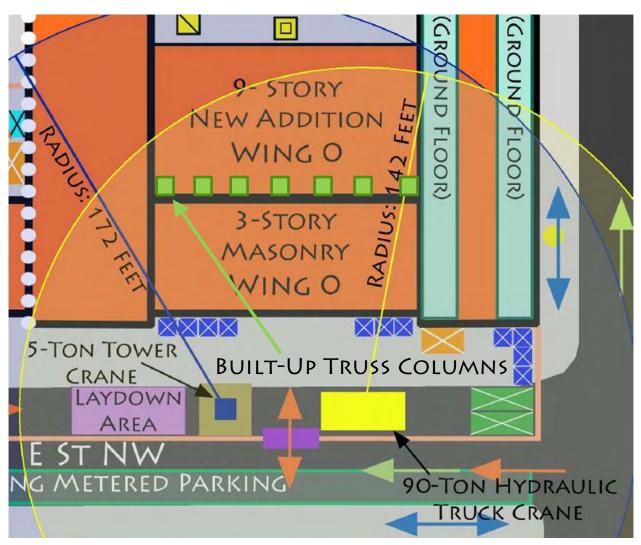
Diagram showing the proximity of the 90-ton hydraulic truck crane to the built-up truss columns – Developed by Ramuel Holgado
